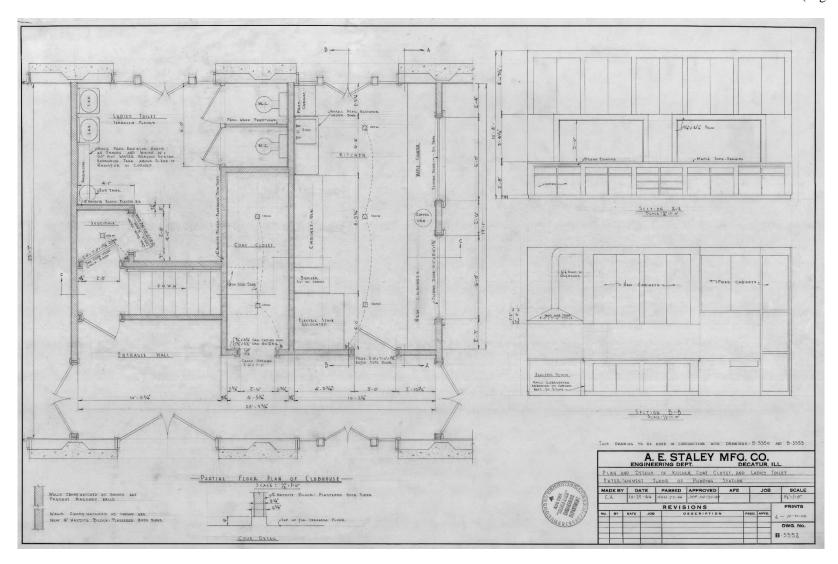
Plan And Details of Kitchen, Coat Closet, And Ladies Toilet; Entertainment Floor of Pumping Station (AES, Drawing No. 5352; 25 October 1944). These plans detail the specific wall changes made within the service core of the Entertainment Level during the 1944-45 remodeling.
